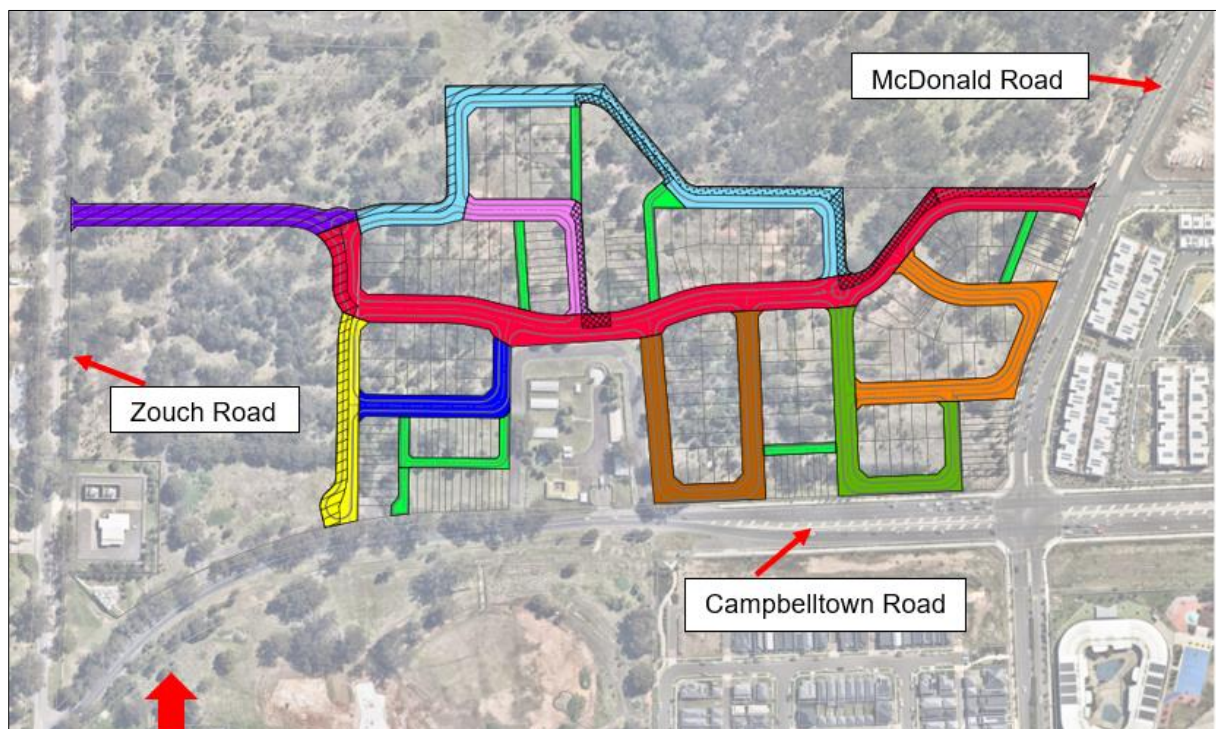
Proposed indicative only Street layout plan for Precinct 9 Edmondson Park
